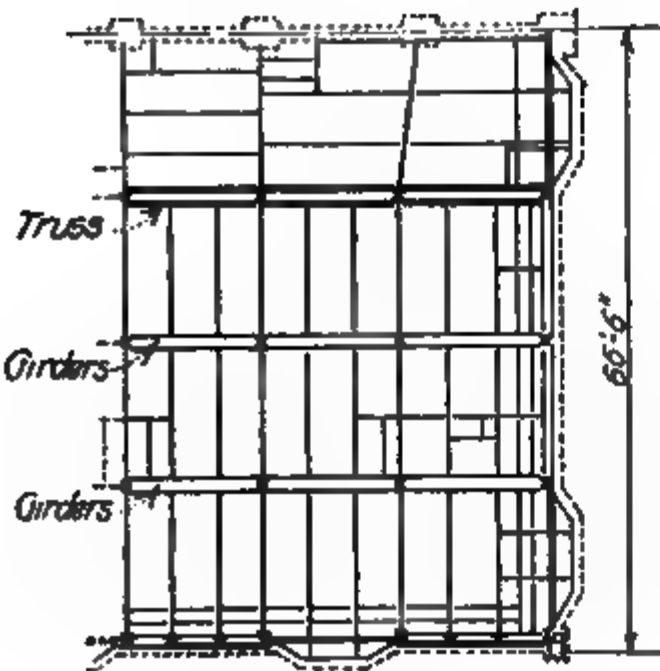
Part third floor framing plan, University Club of Chicago.
